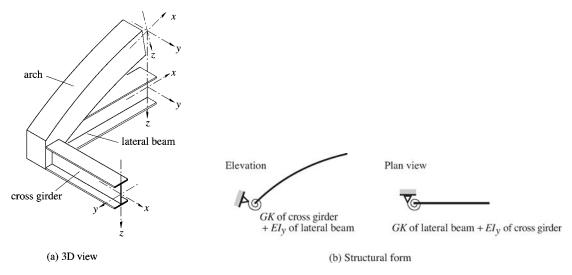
Semi-rigid restraint of an arch end by a cross girder and a lateral beam.
